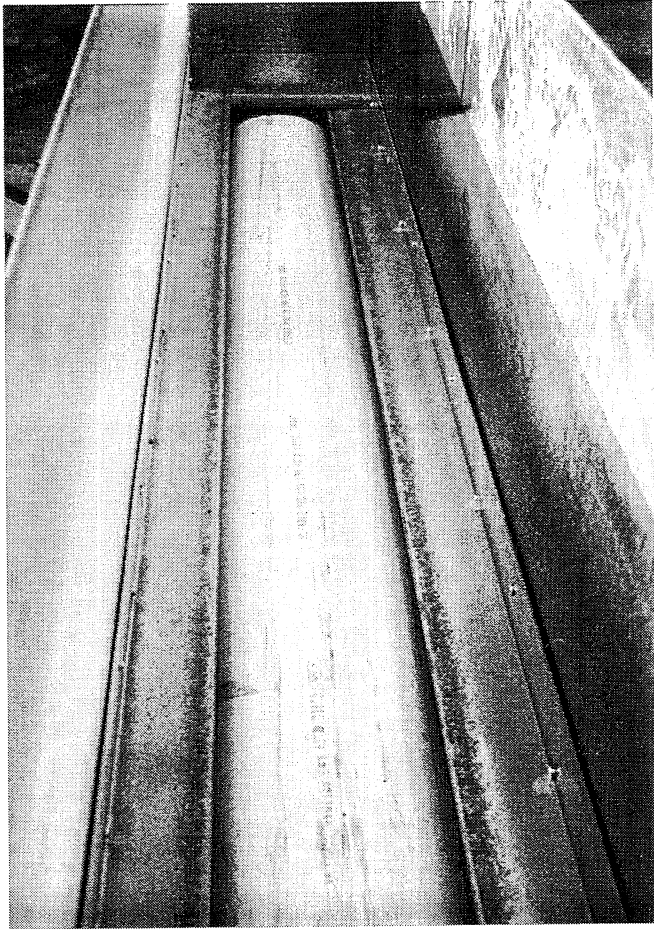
Manifold/diffuser section showing manifold and impact sills (Aug 1989).
